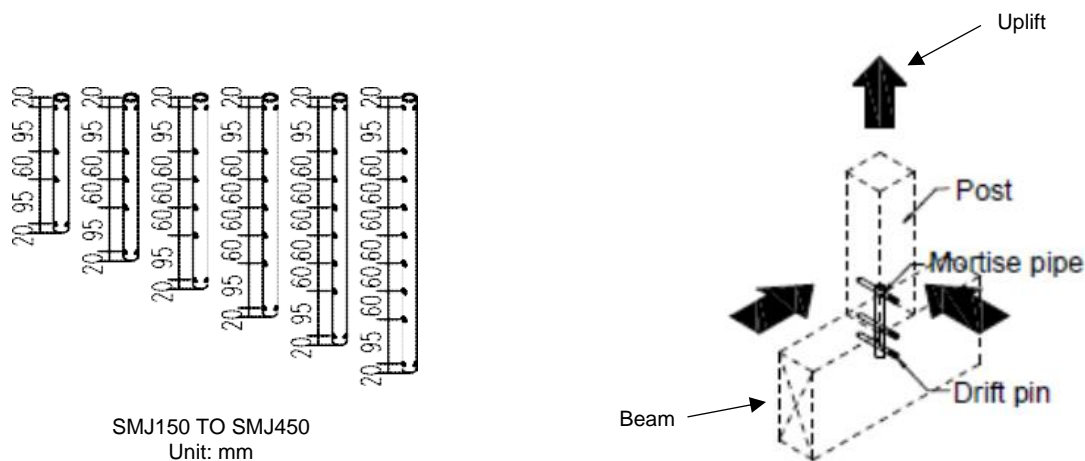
SHAWOOD SMJ MORTISE PIPE CONNECTORS POST-TO-BEAM CONNECTION AND INSTALLATION (TYP)
